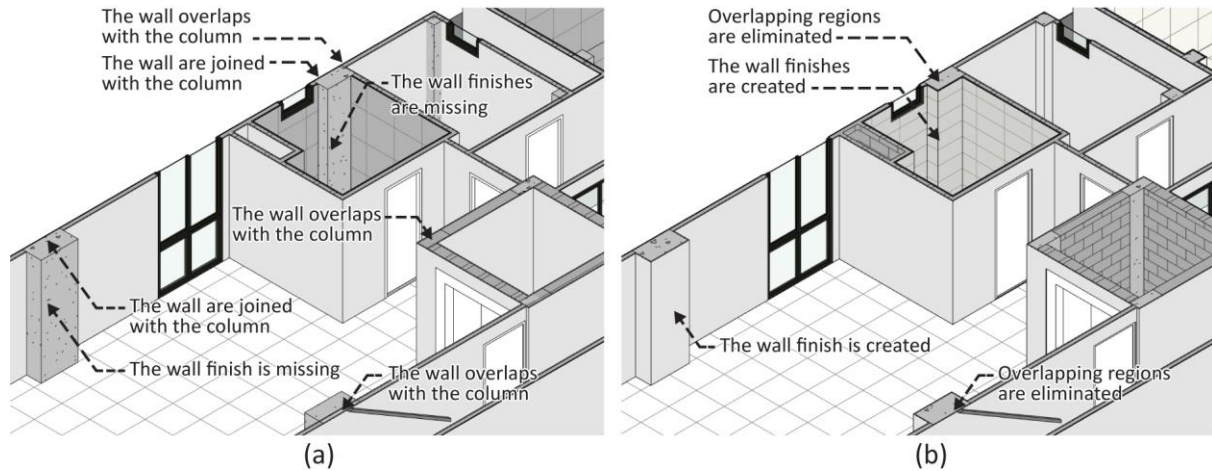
(a) Some walls in the original BIM model overlap with structural columns and some walls are joined with structural columns. (b) Walls in the manually modified BIM model after editing and the separation of each wall layer.
